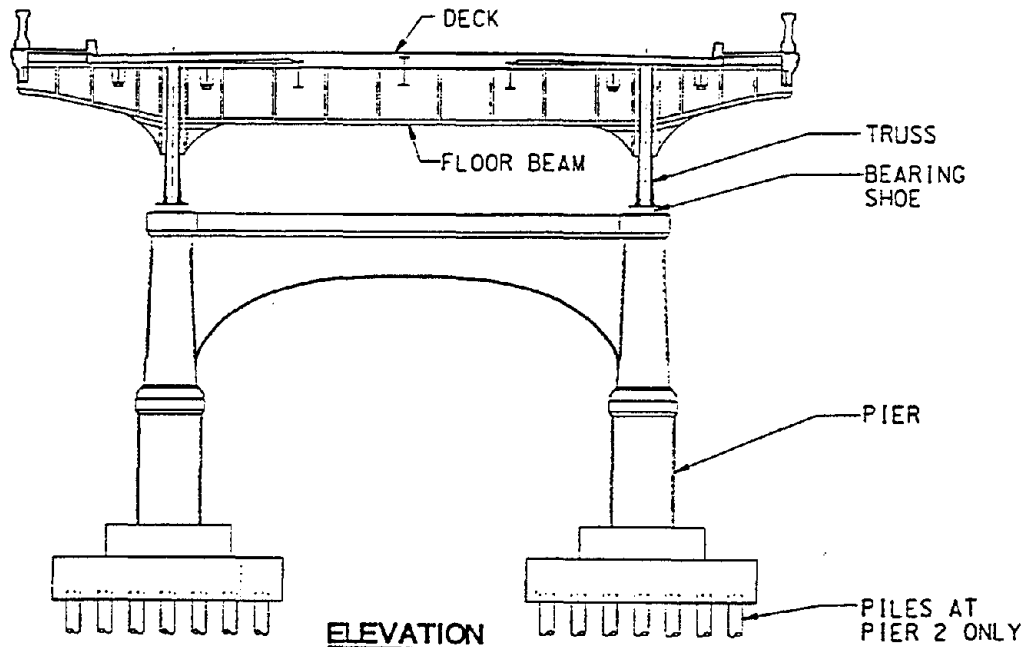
TYPICAL TRUSS SECTION AT PIER
